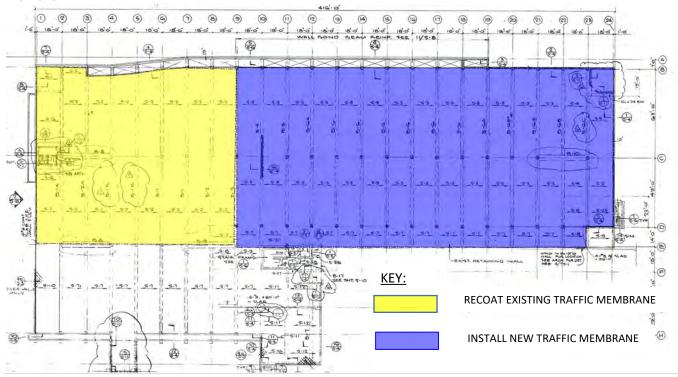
Proposed new traffic membrane and existing traffic membrane locations, Plaza Parking Structure - Pier level
